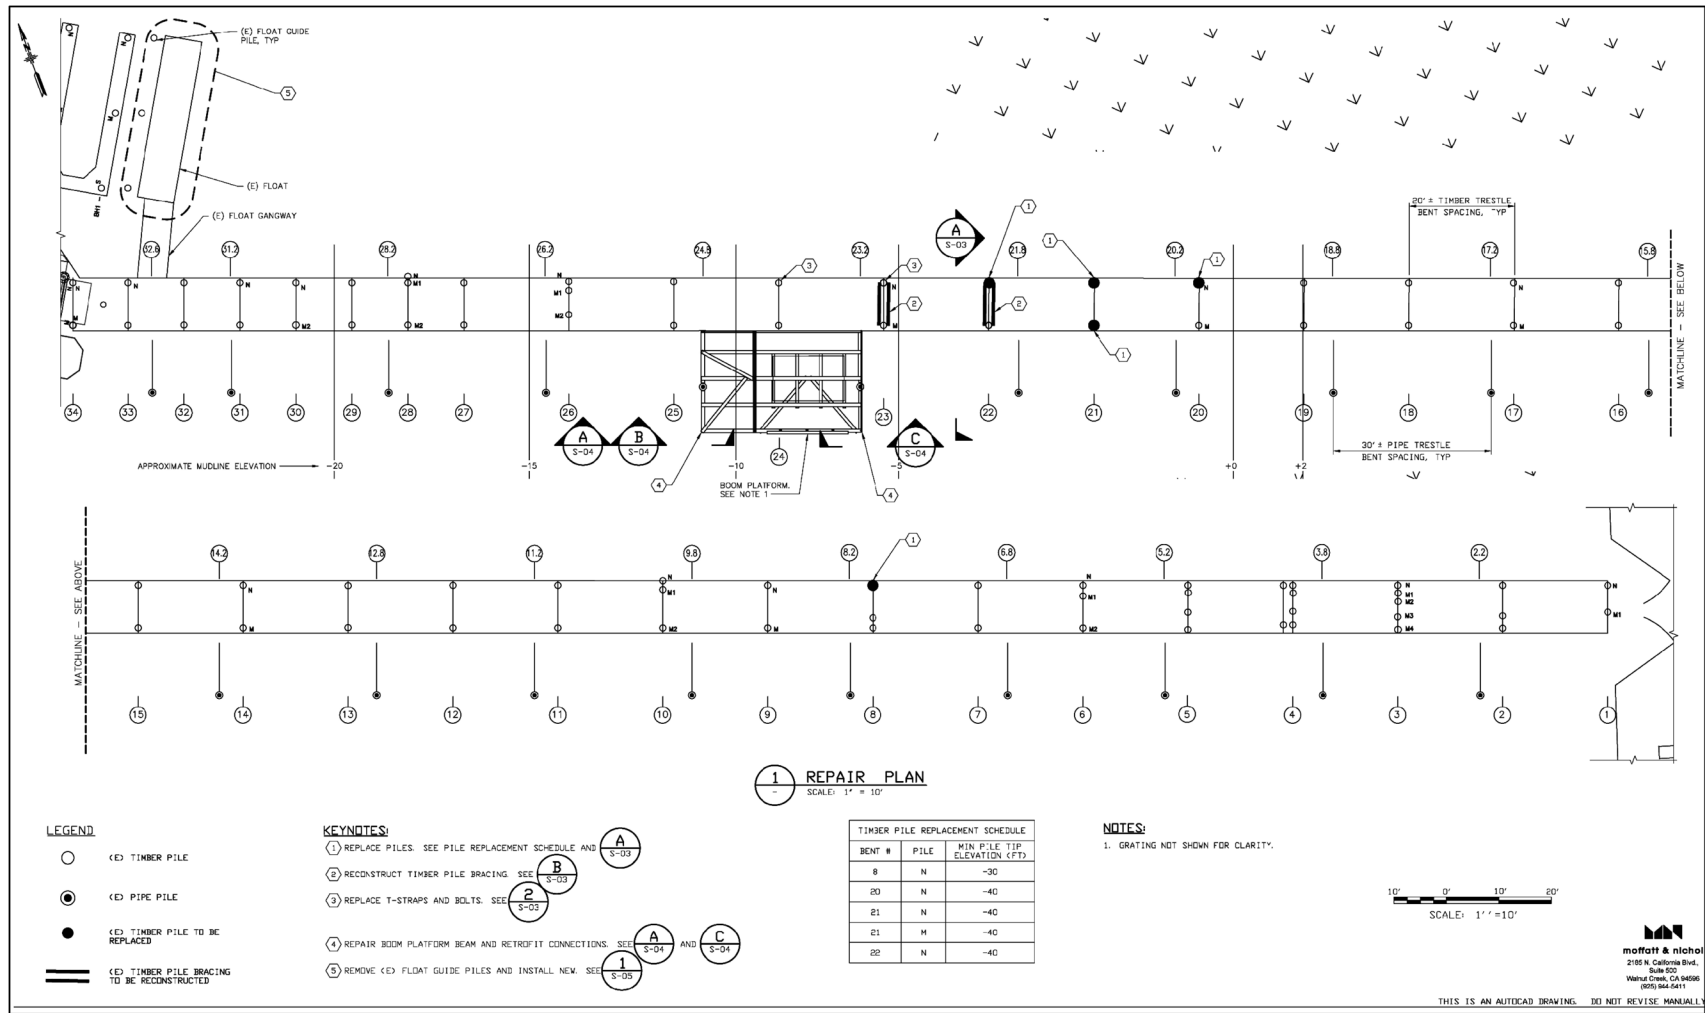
General Plan for Causeway Repairs at the Chevron Eureka Terminal
